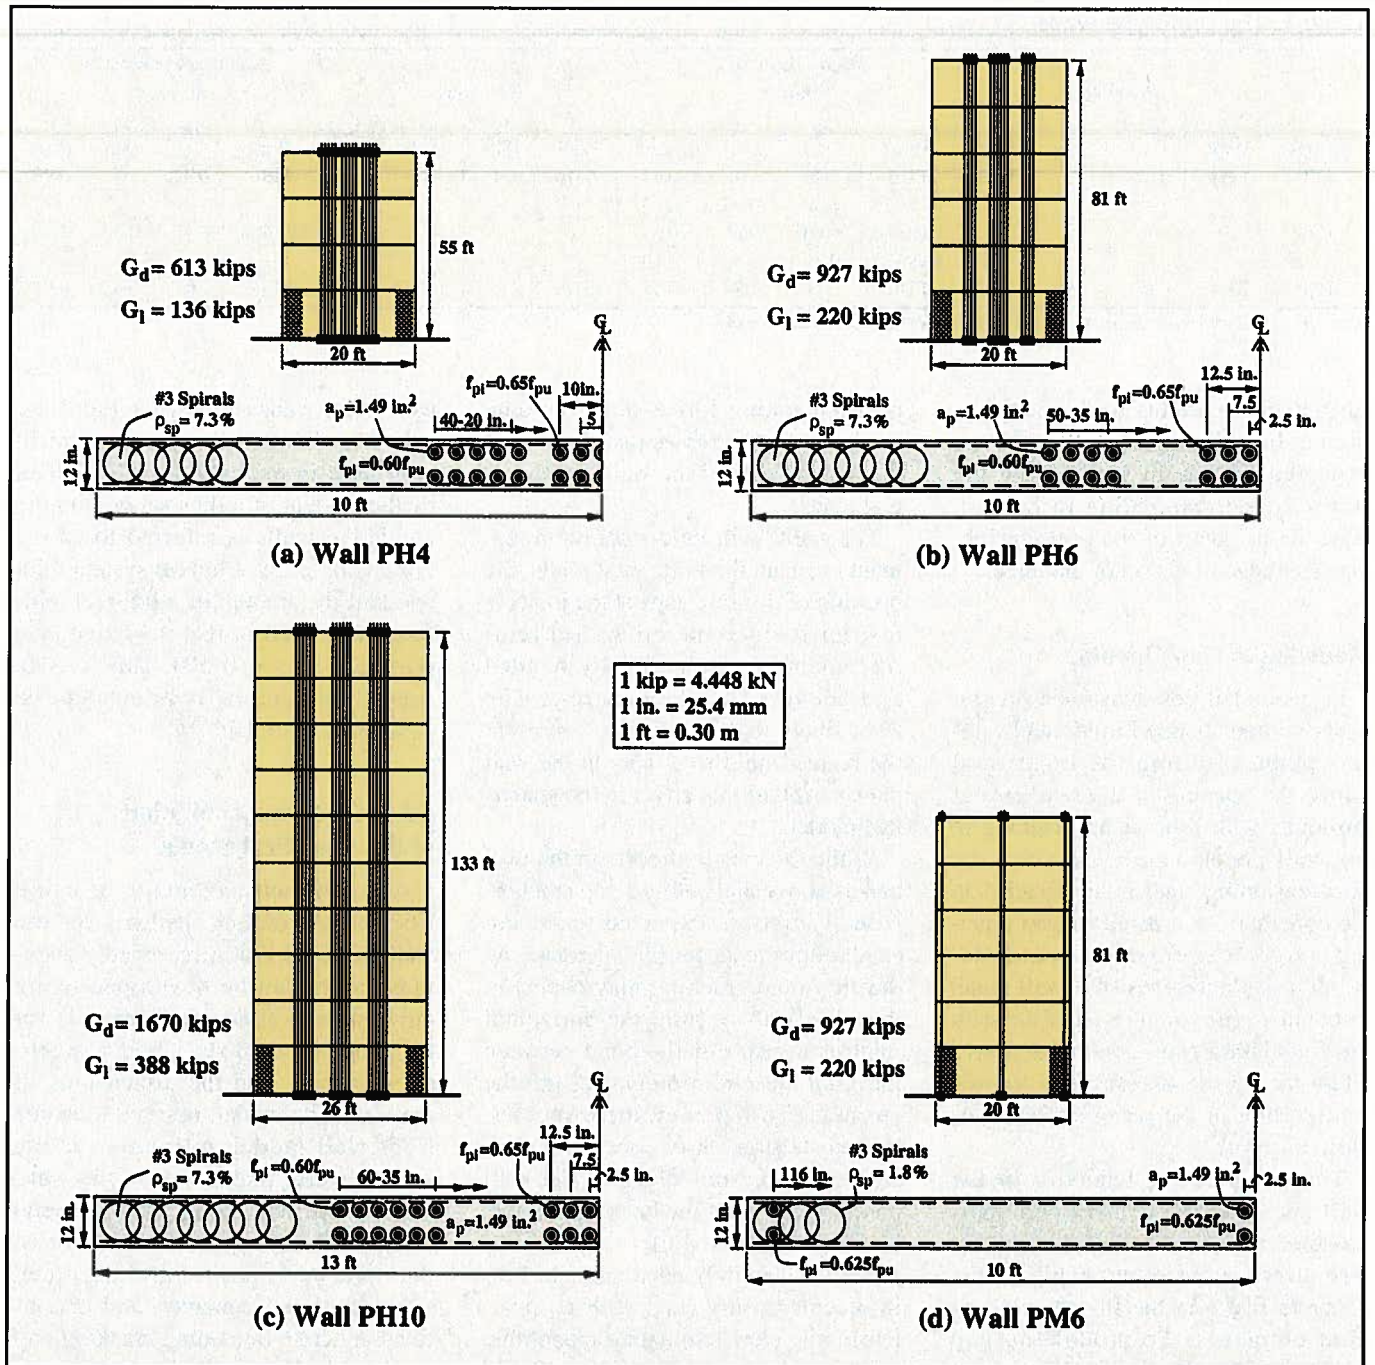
Elevation and cross section (half wall length near base) of unbonded post-tensioned walls: (a) PH4; (b) PH6; (c) PH10; (d) PM6.
